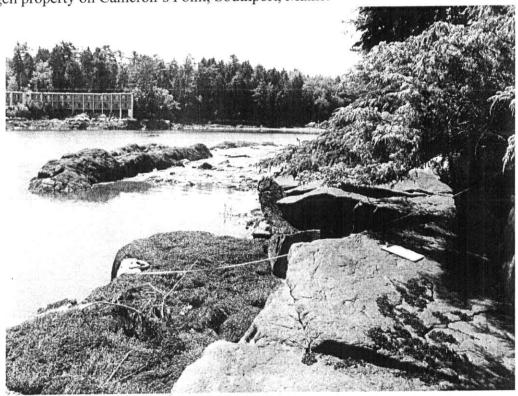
Side view of the proposed pier location looking south. Ocean Gate Inn in the background is located on the opposite shore of the cove.
